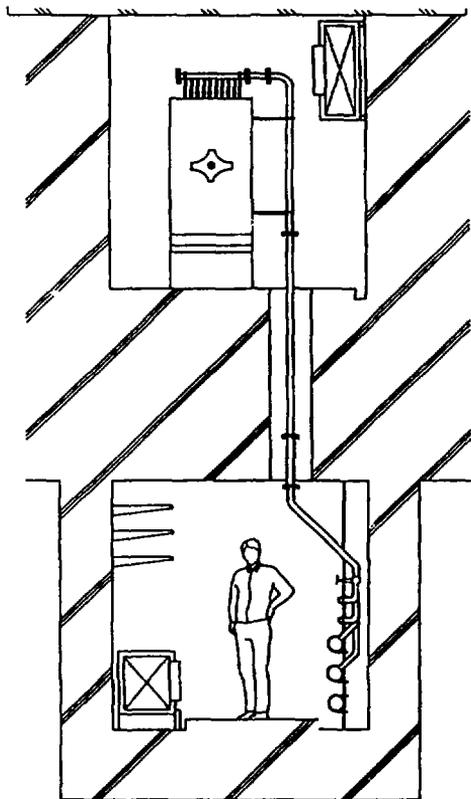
Cross section of the beam line tunnel in the new experimental hall.
